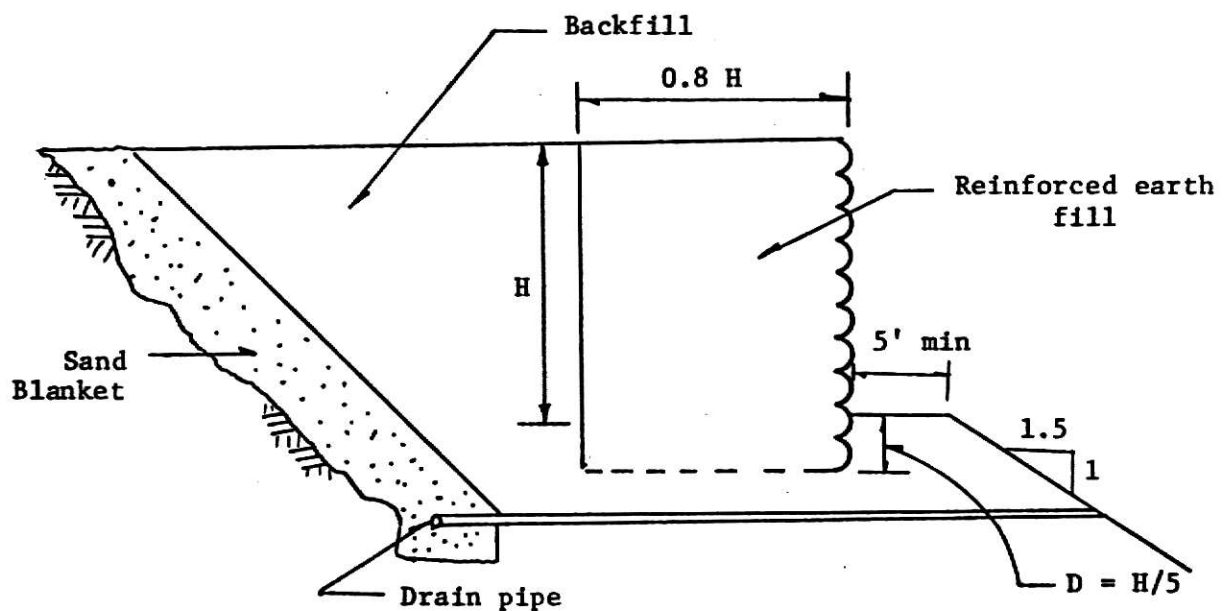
Tentative Dimension of Reinforced Earth Wall for Stability Requirements
